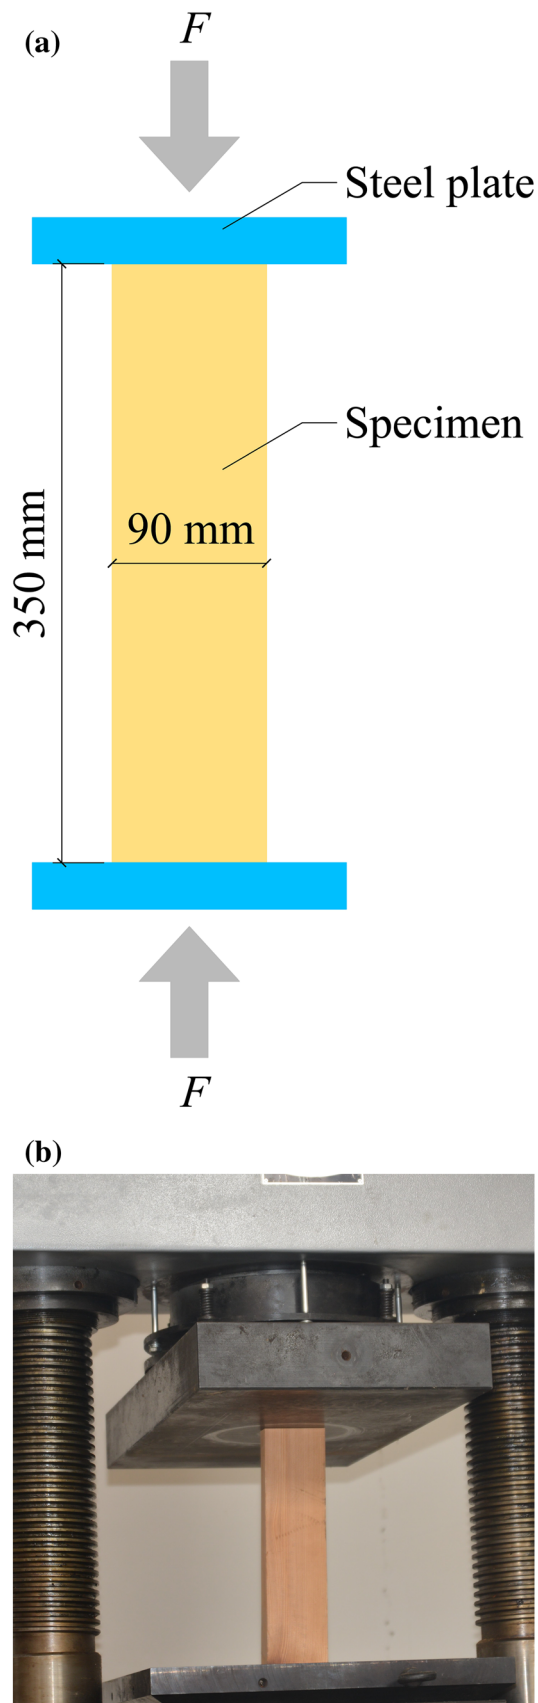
Static compressive test on specimens: a schematic drawing; b photo
